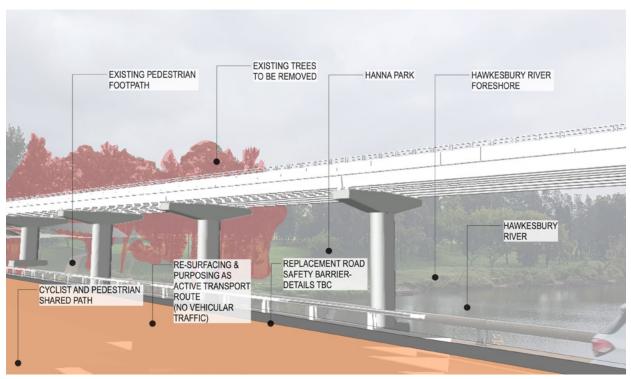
Viewpoint 3 - Proposed view from the existing bridge (Bells Line of Road), facing towards North Richmond
